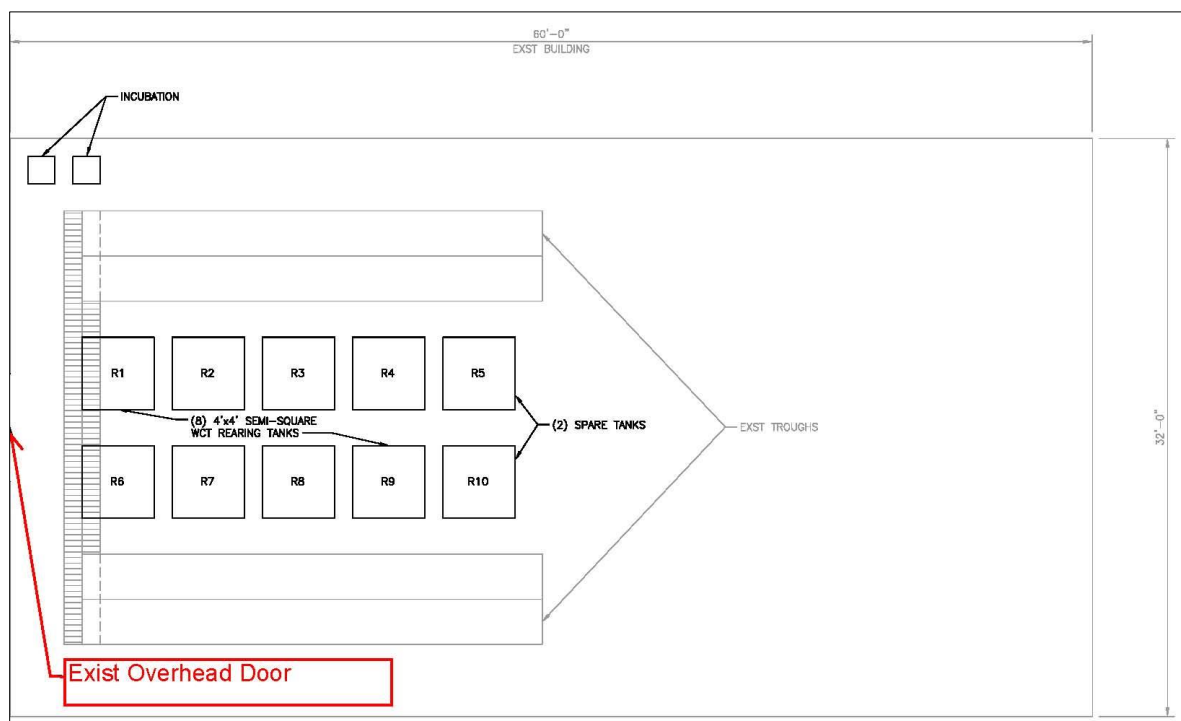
Upper Hatchery Building Layout – Decentralized WCT Option
